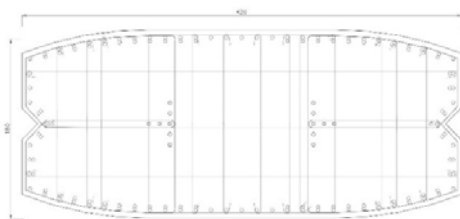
Dimensions and Rebars of the pier section of Shahid Bakri bridge in the first 4 meters (plastic hinge area)
